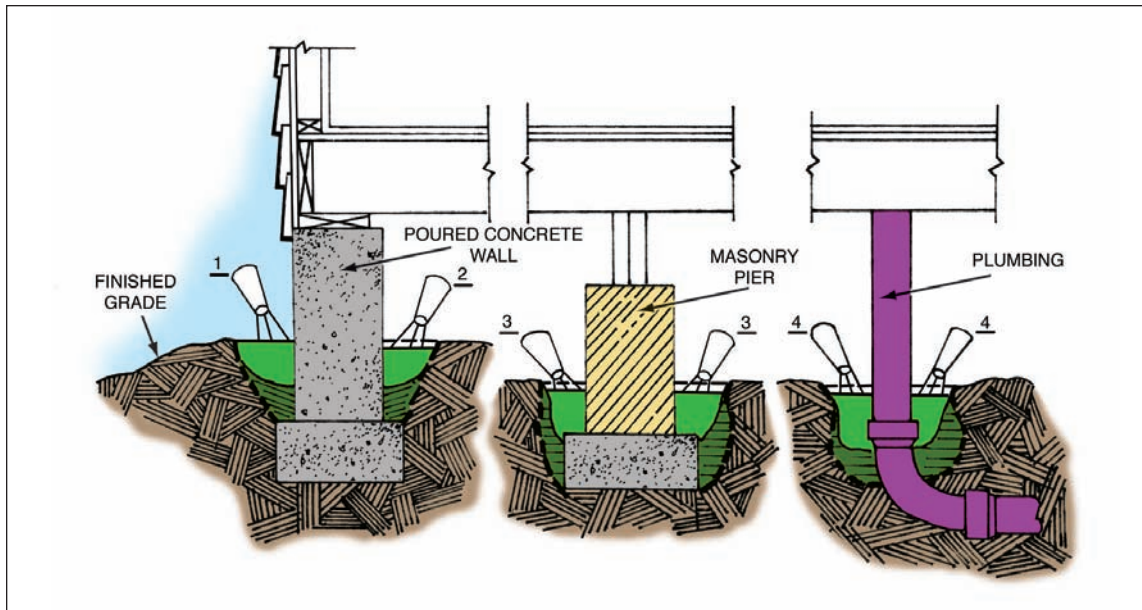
Application of a chemical to crawlspace construction. Soil treatment is applied (1) alongside outside wall, (2) inside wall, (3) around pier, and (4) around plumbing.
